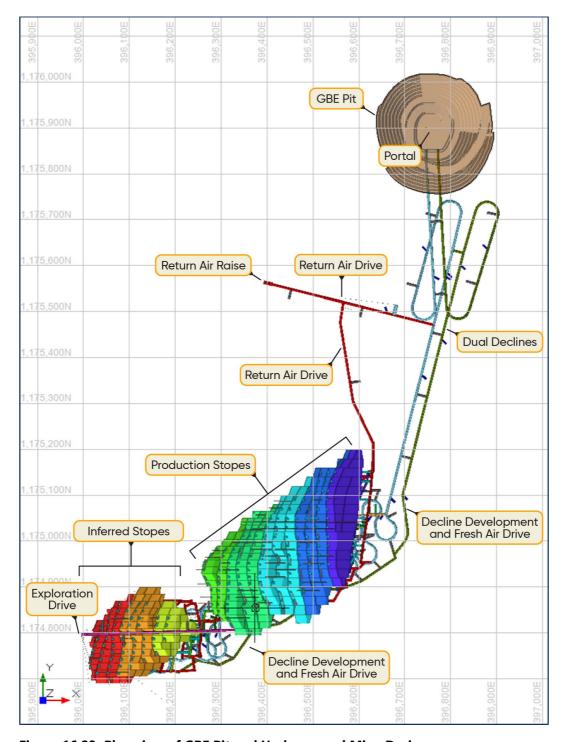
Plan view of GBE Pit and Underground Mine Design
